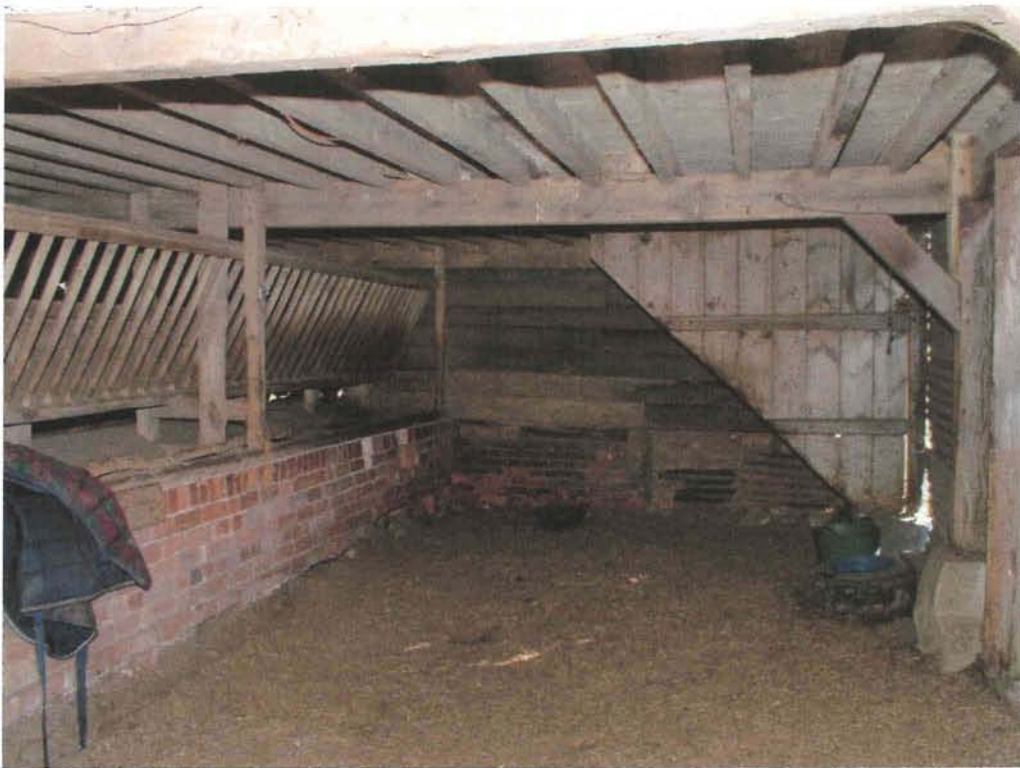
Stable building showing feeding trough, lower part of Truss 3 and boarded stairs. Photo CPAT 2091-020
